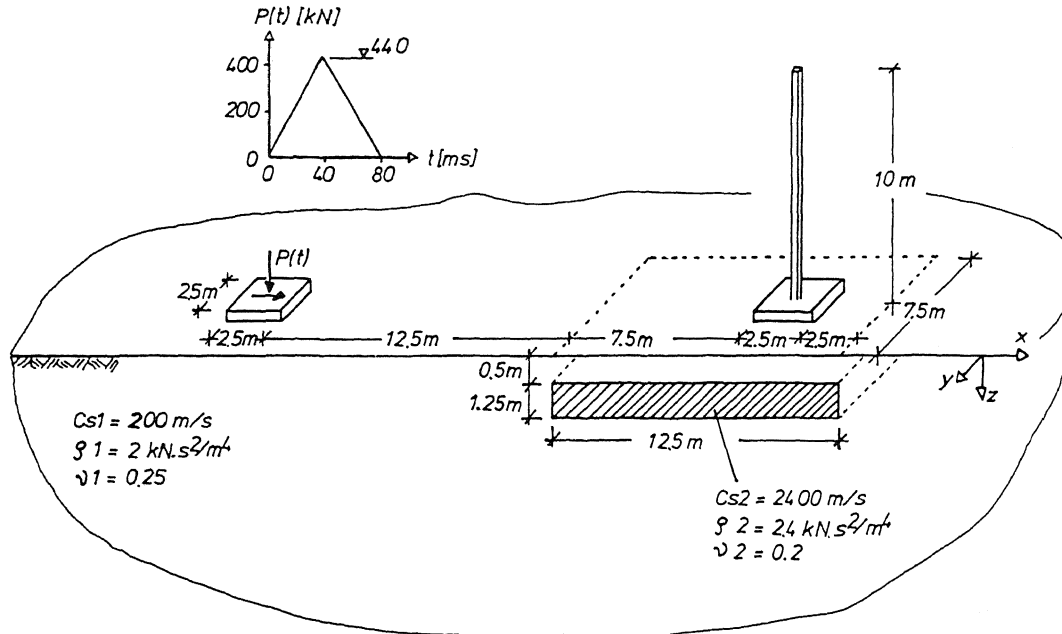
Foundation-soil-foundation-structure system with an artificial bedrock.
